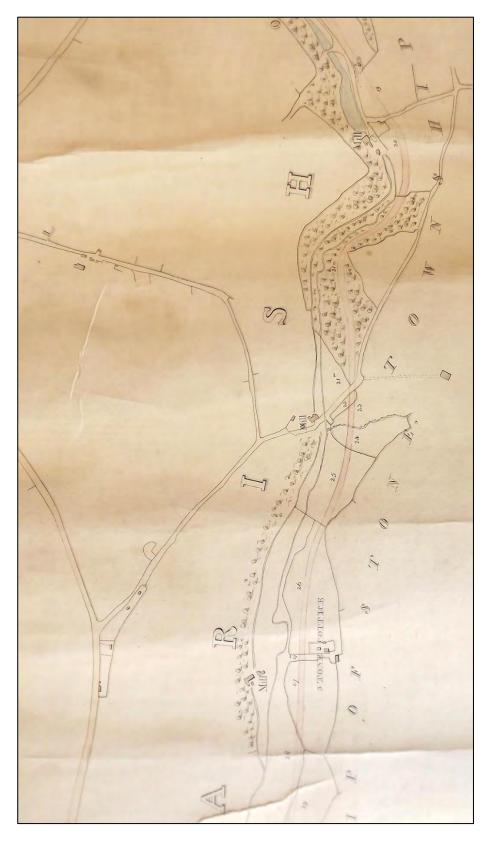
Plan of proposed diversion or new line of road in the Stone Lane End Trentham Turnpike Trust in the County of Stafford 1833. Section from Ivy Mill in the north to Coppice Mill in the south. The proposed road is shown in pink. (reproduced with permission of Staffordshire Record Office)
